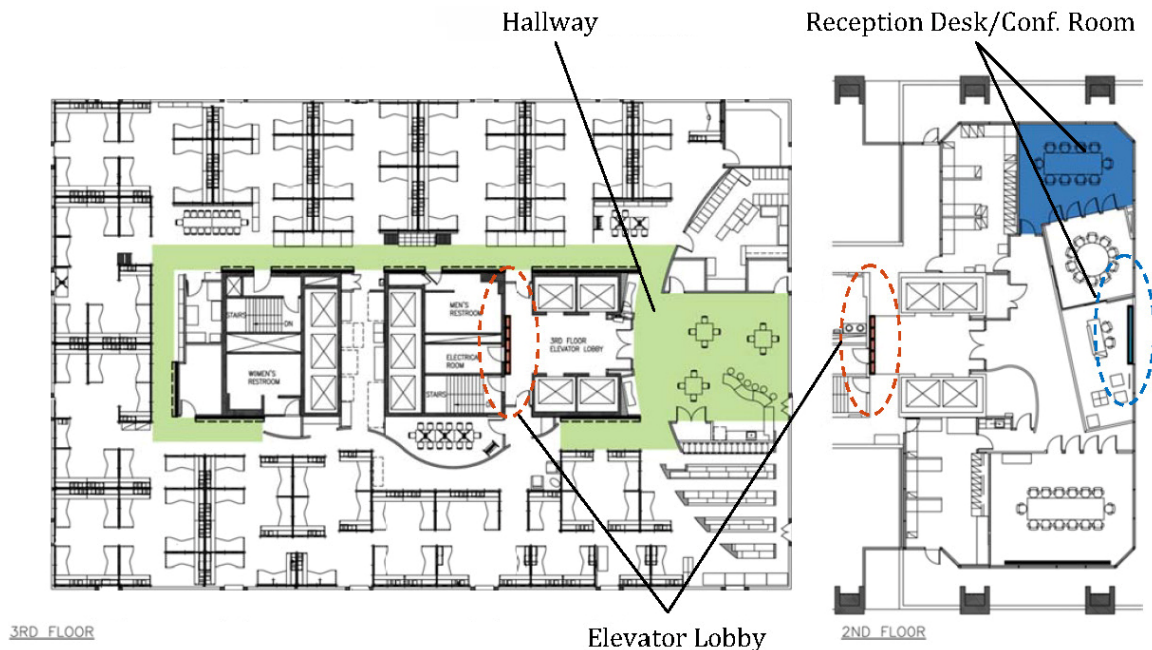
Proposed Floor Plans (Image prepared by Takao Ugai)
